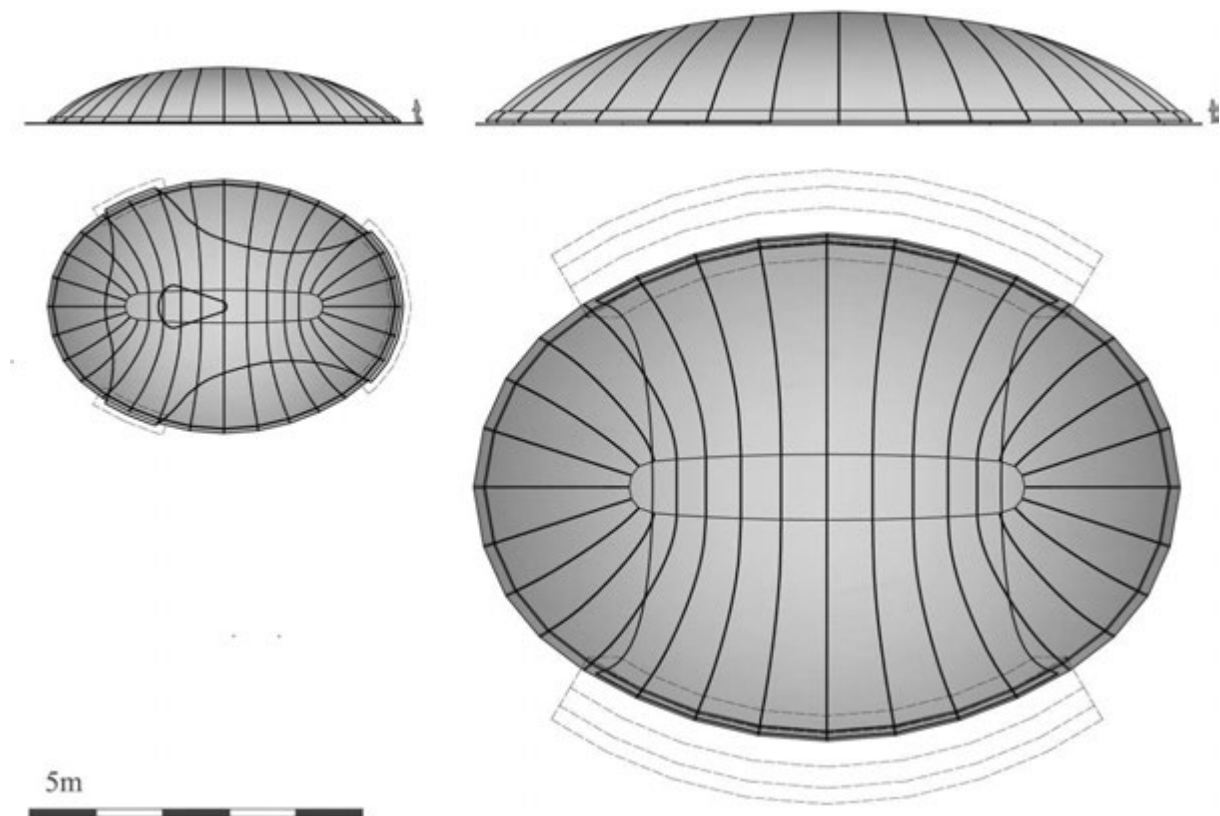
Concrete shell of the event canopy (left) and the shell bridge serving as deer pass (right)
